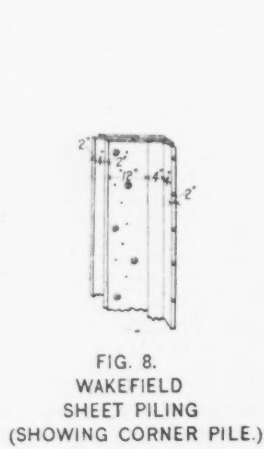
WAKEFIELD SHEET PILING (SHOWING CORNER PILE.)
